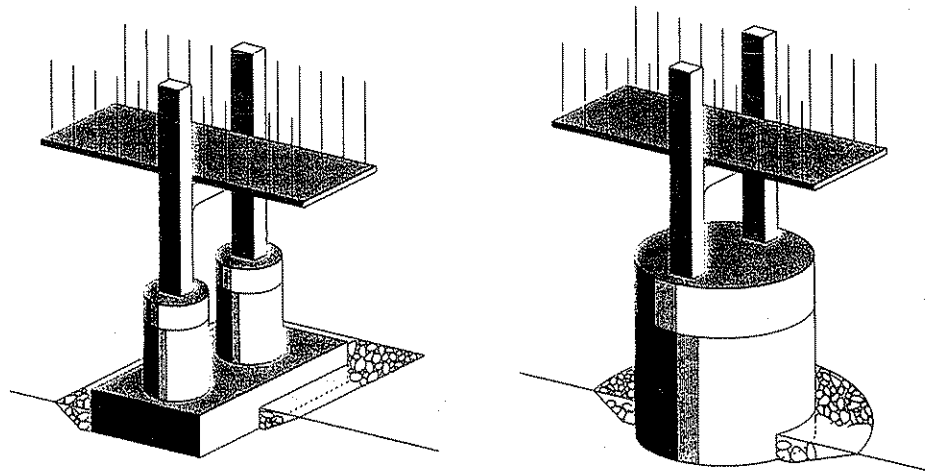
Twin-Shaft Type Foundation (left) and Cylindrical Solid Foundation (right)
